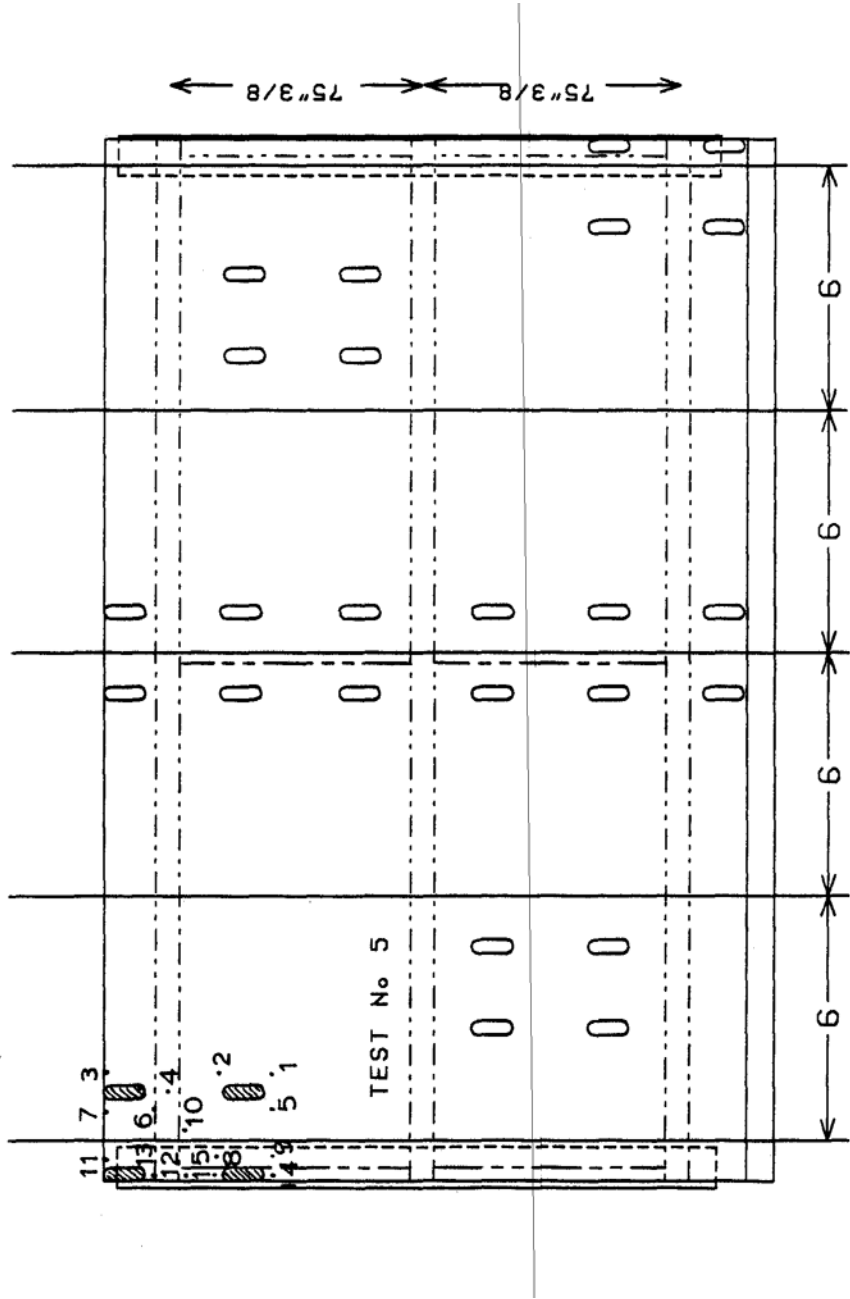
LVDT Locations (Second Bridge - Test No. 5)
